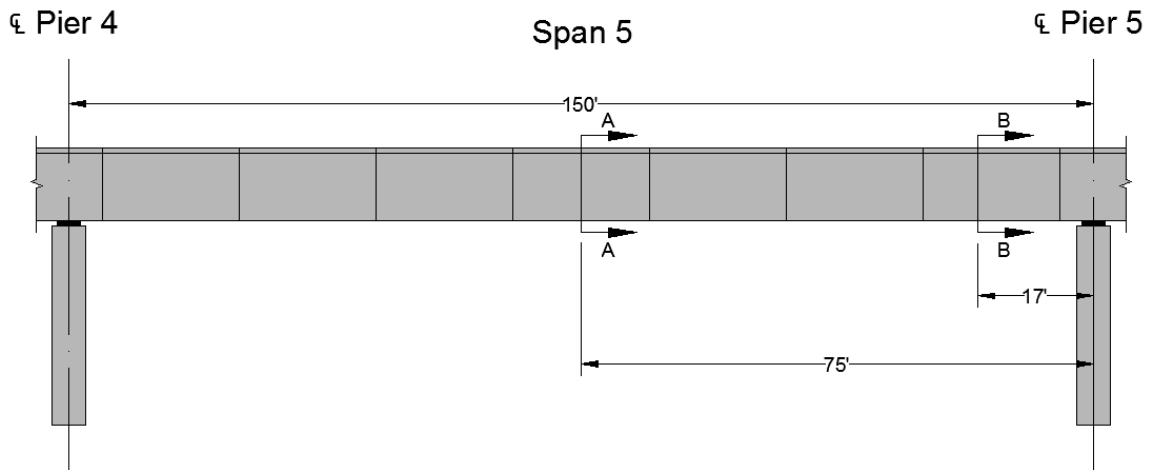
Varina-Enon Bridge Span 5 Elevation View Span 5 Instrument Locations
